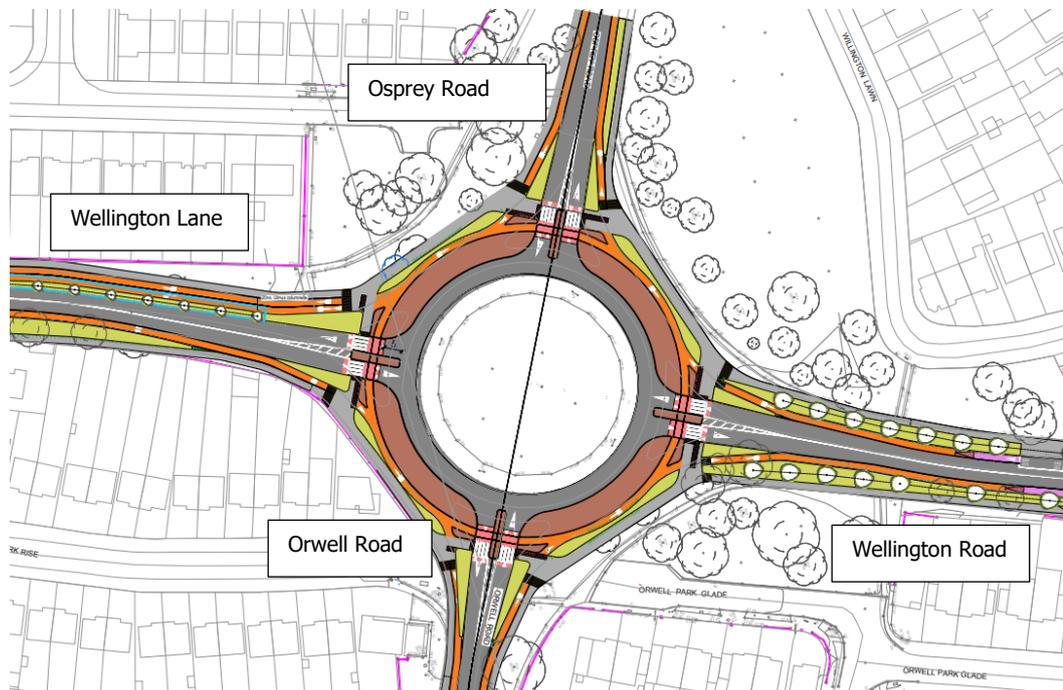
Proposed Landscape Proposals at Orwell Roundabout
